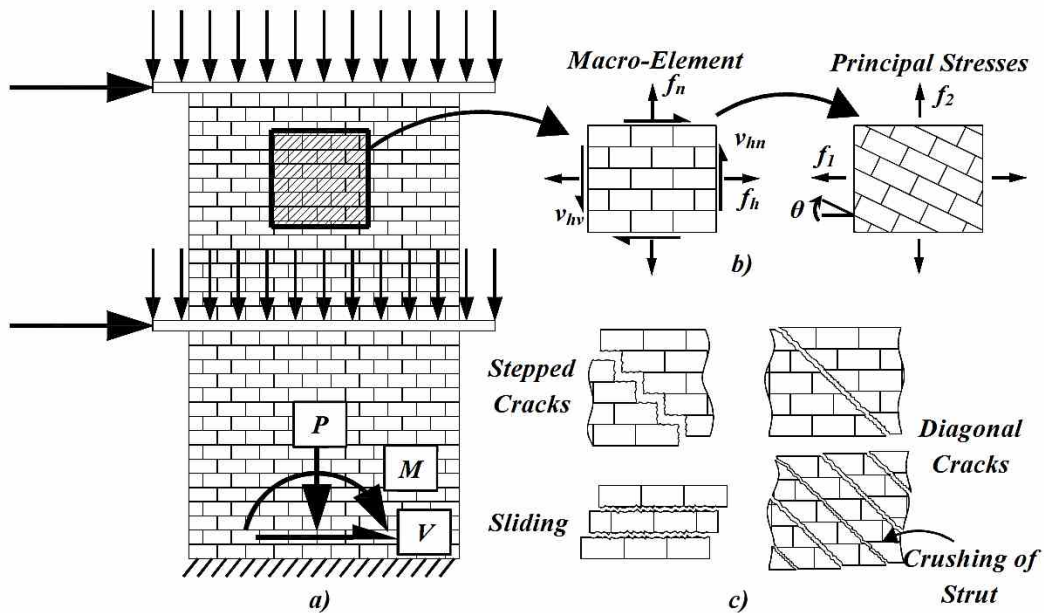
Behavior of RM subjected to Combined Loading: a) A Typical RM Structural Wall subject to Axial and Shear Forces and an Applied Moment, b) Equivalent RM Macro-Element, c) Typical Shear Failure Modes in Masonry
